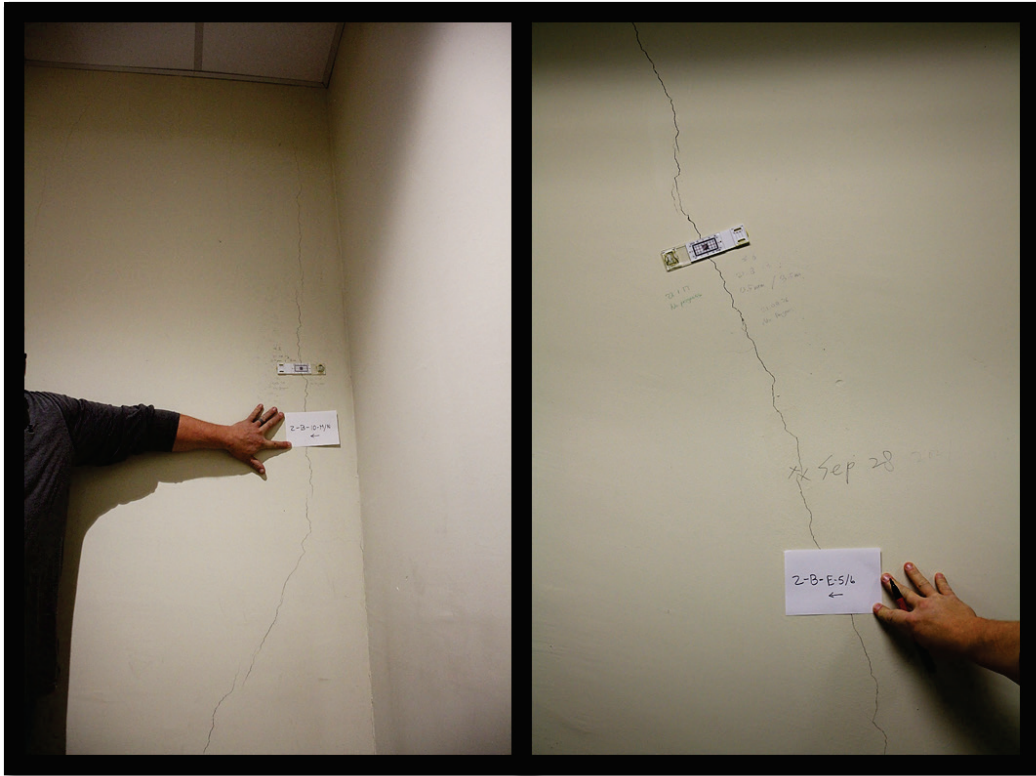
Wall crack with gauge in Tower 2 basement.
